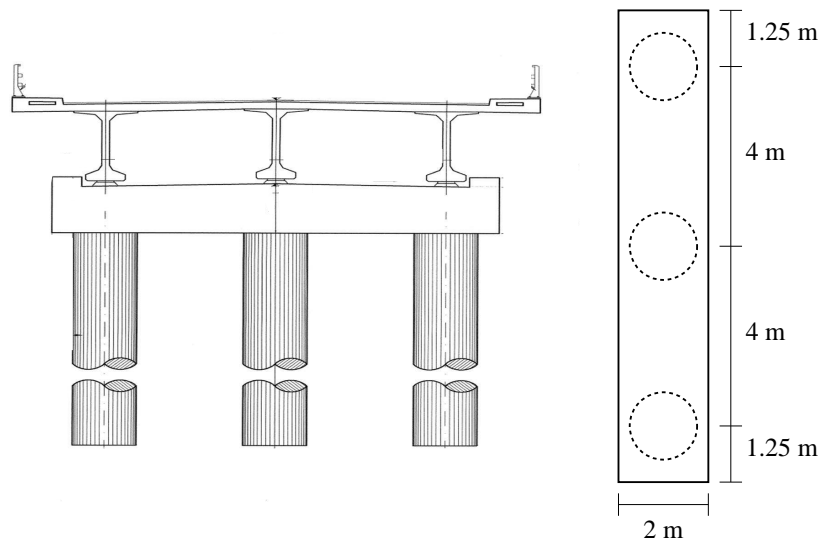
Elevation and plan views of typical interior pier shaft cap for Puente Mataquito (courtesy Ministerio de Obras Públicas, Chile).
